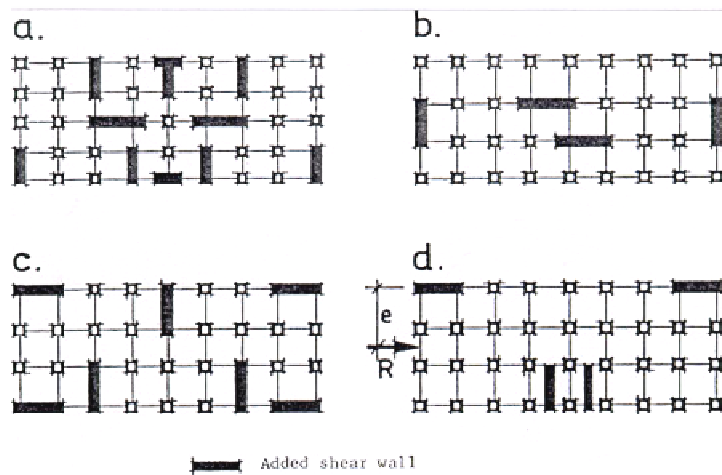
RC building retrofitted by introduction of shear walls [9].
